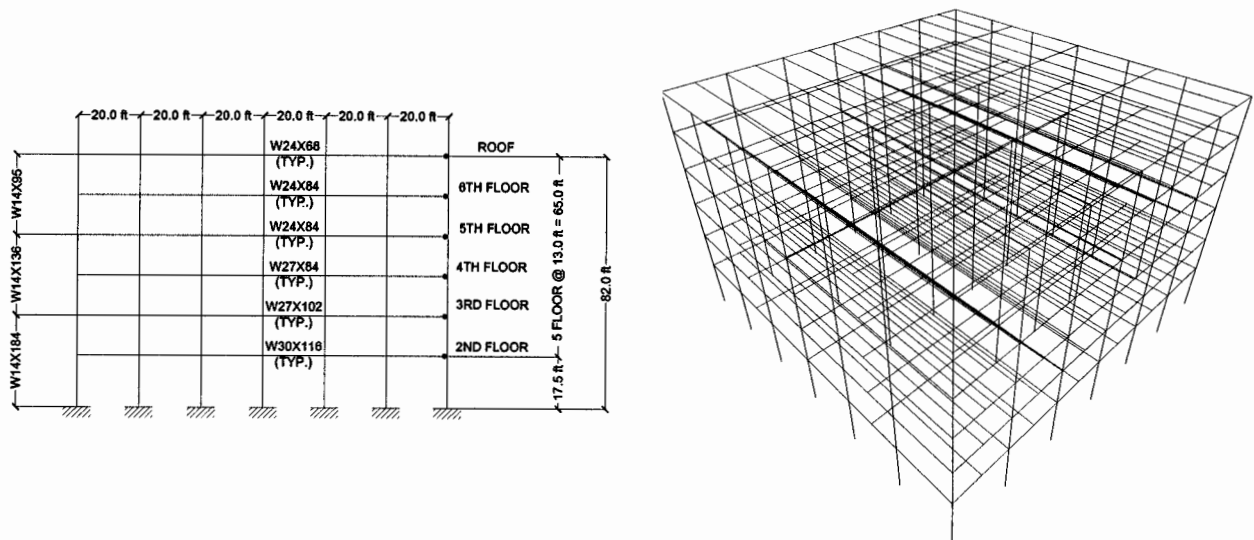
Elevation of Typical Perimeter Frame and SAP2000 Model of Building
